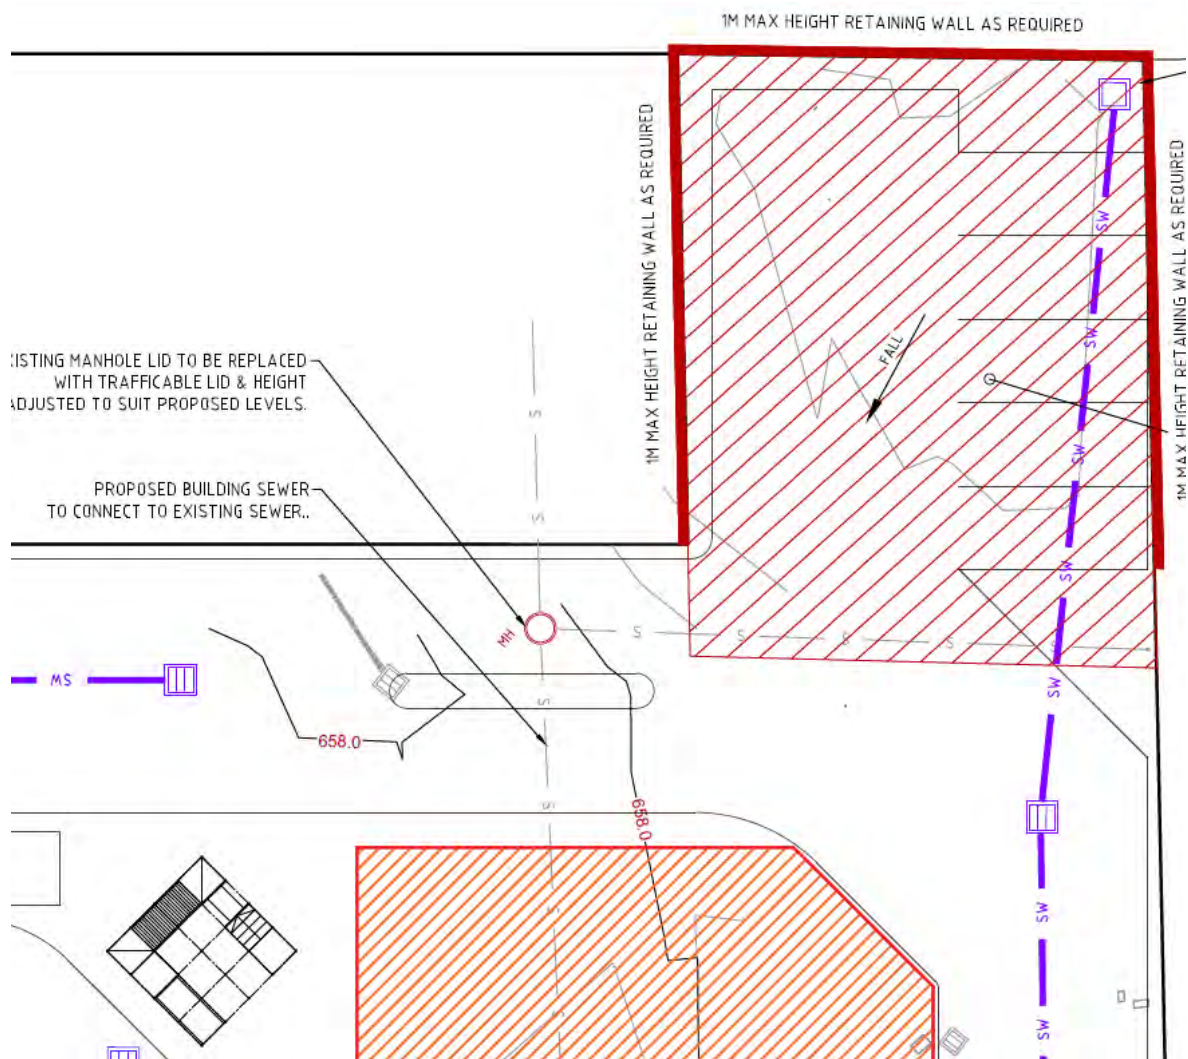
Earthworks and Servicing Plan – Fill and Retaining Walls (Shown Dark Red) with a Maximum Height of 1 metre Proposed at Eastern End of Site (Lot A DP 197473, 105 Durham Street)
